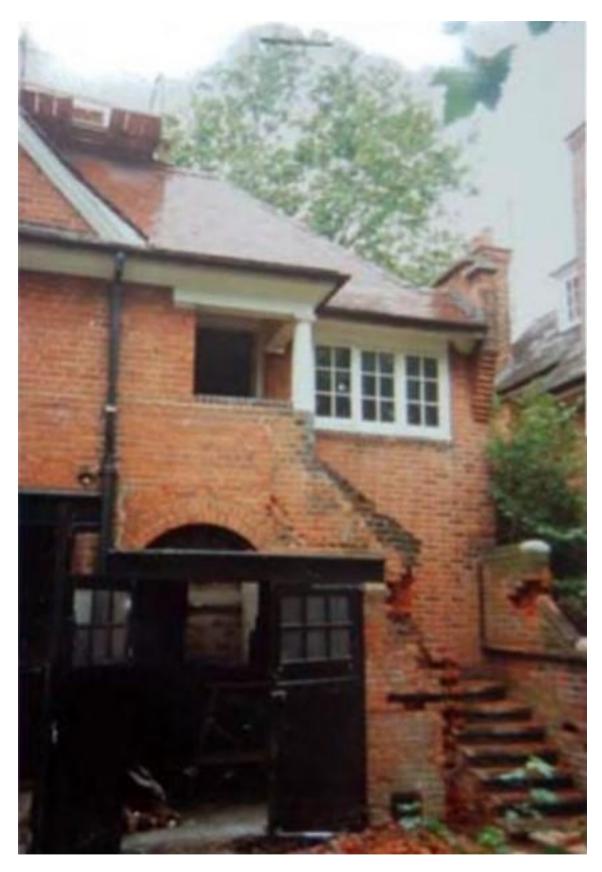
The original access and doorway to the first floor will be retained, which is considered to be of significance to the listed building, its appreciation and the character of the Conservation Area. © Chilcroft 2023
